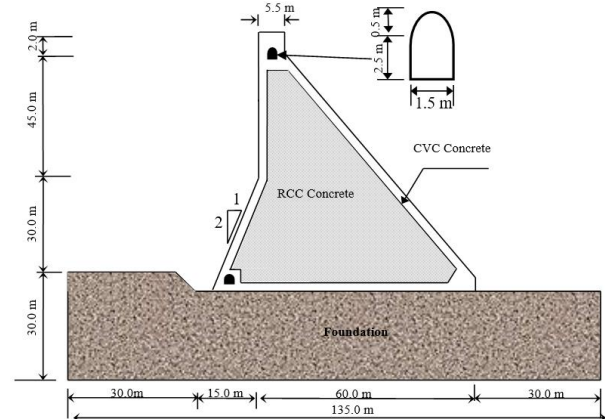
Structural Geometry for Bu Mansur RCC Dam
